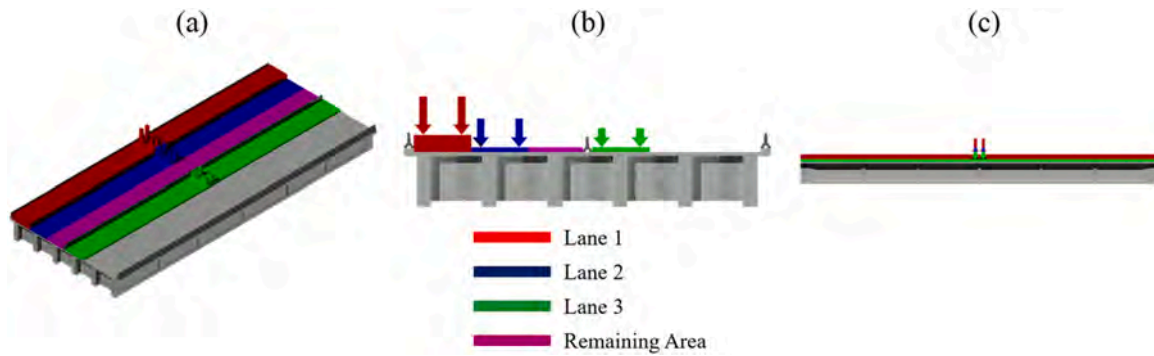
Arrangement of traffic loads: (a) 3D view, (b) transverse view, (c) longitudinal view.
